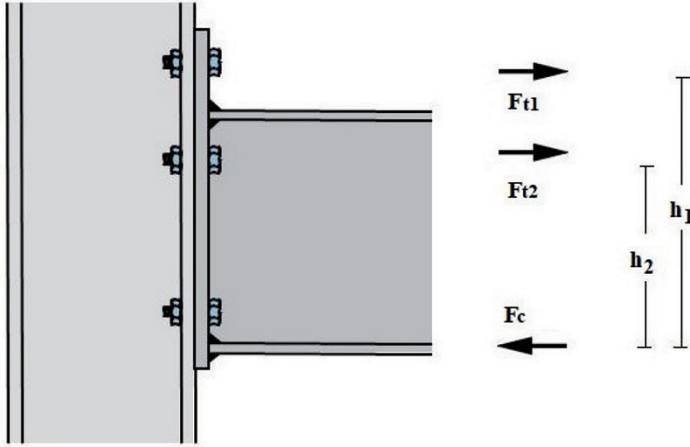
Forces and lever arms in a bolted beam-to-column joint
